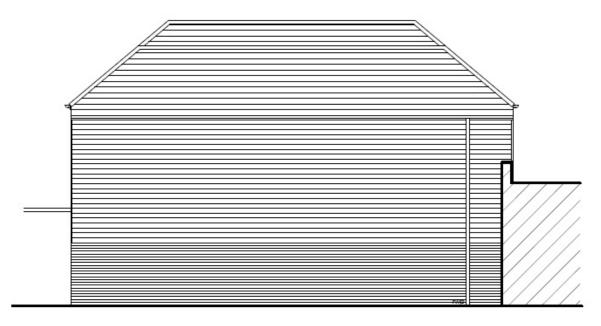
South Elevation as existing (Courtesy of Melling Ridgeway and Partners)
